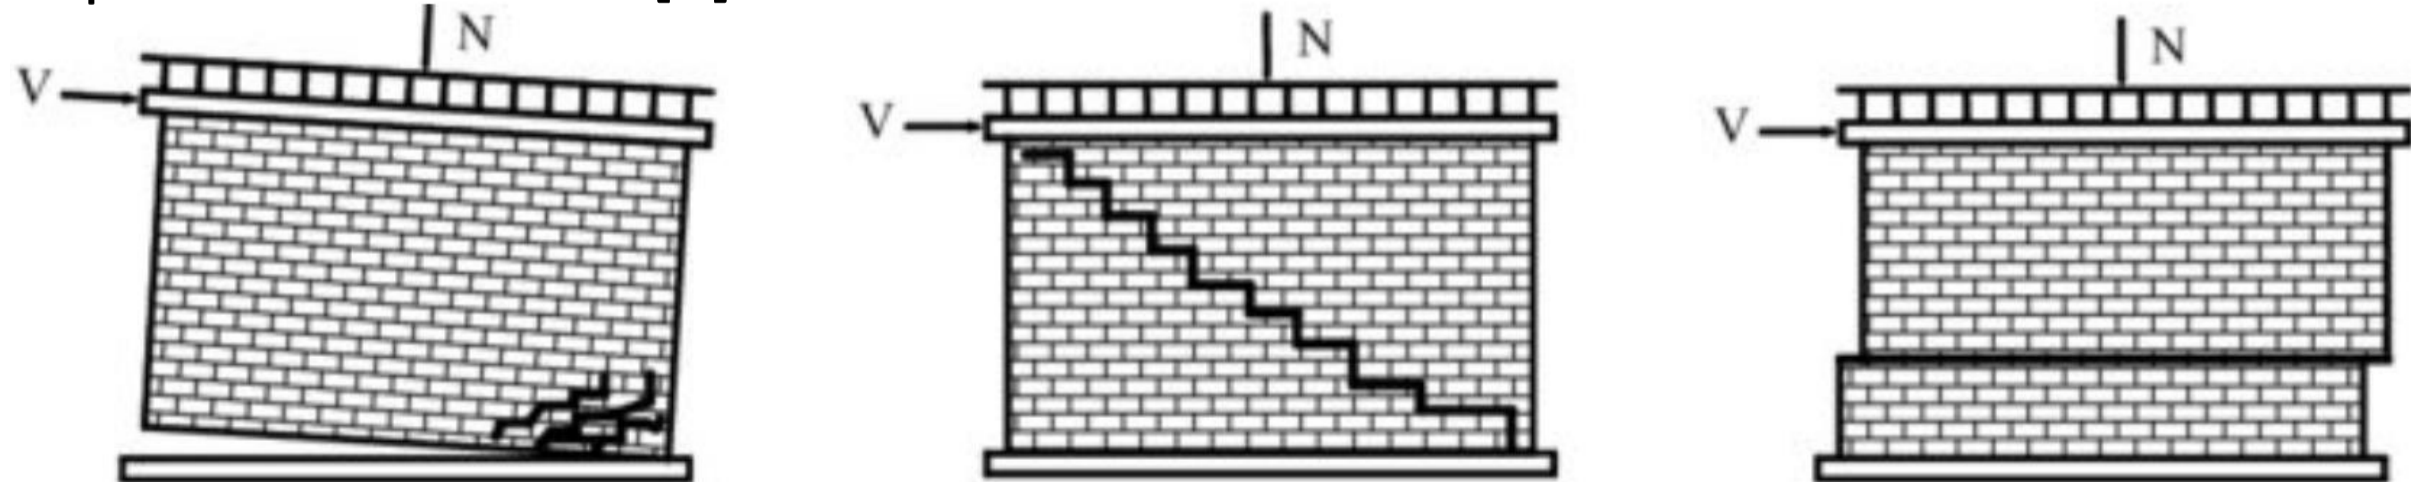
Crack patterns in UnReinforced Masonry (URM) walls (a) rocking failure; (b) diagonal cracking; (c) bed-joint sliding [3]
